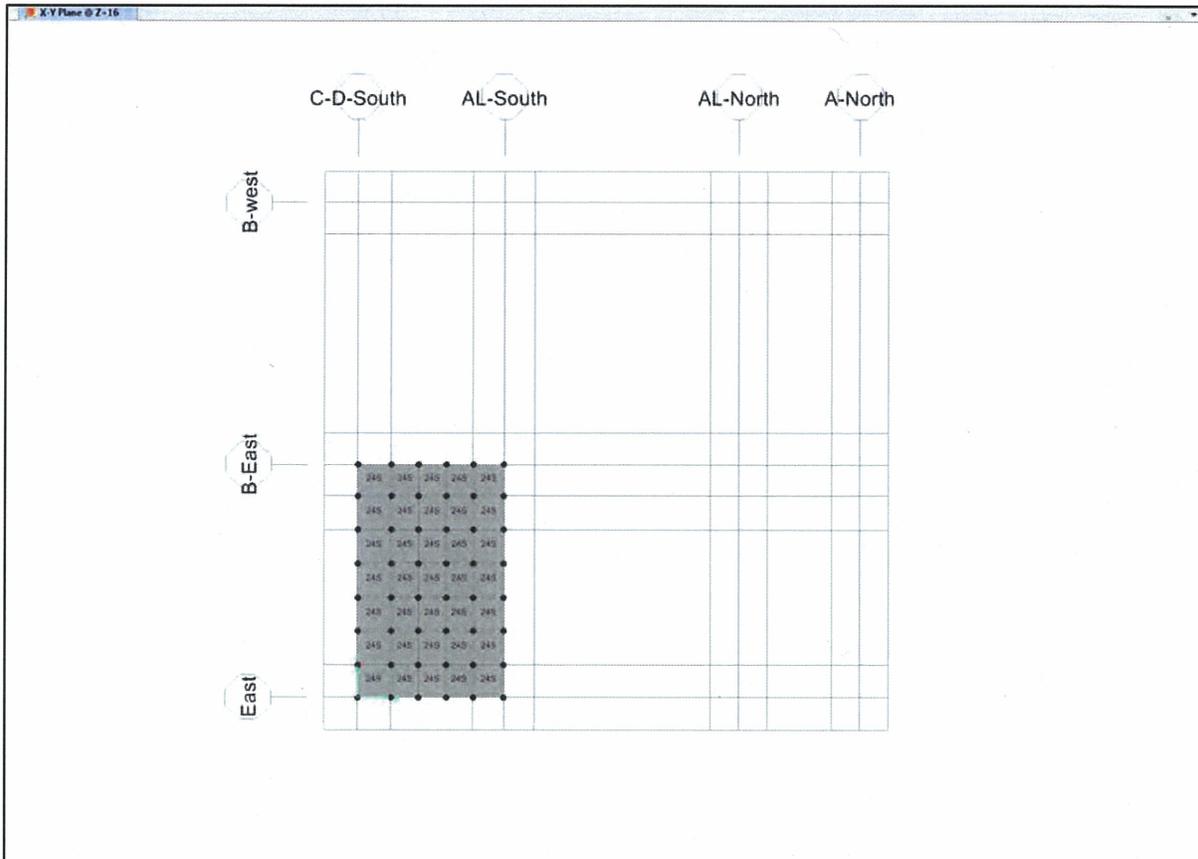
REC SAP2000 D-Cell Floor Plan at Z = 16-ft
